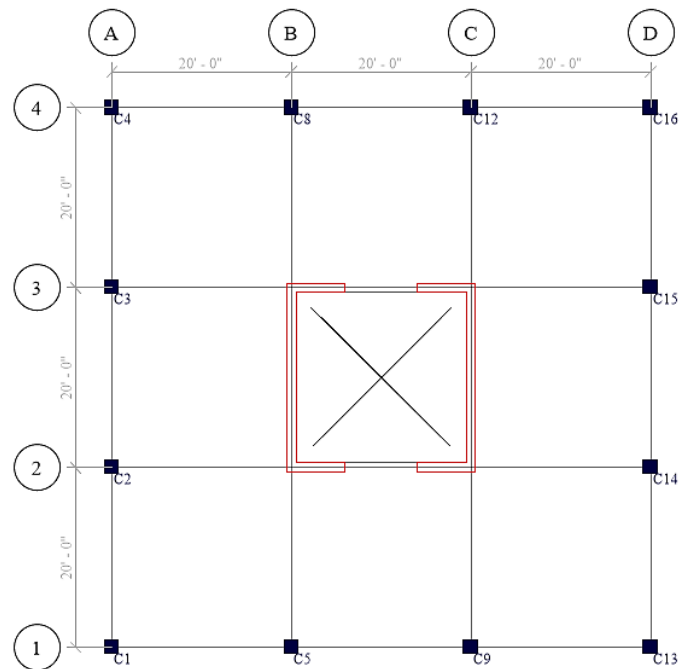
Column layout Plan of Moment Resisting Frame with Shear wall
